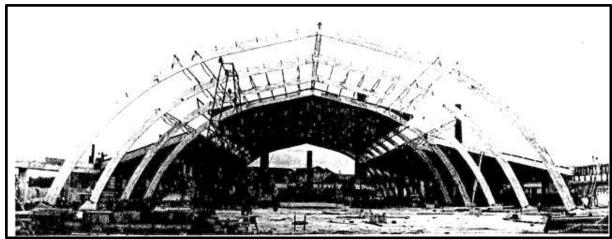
Arches under construction at Symonds St Peters Factory (Holland Street section), c1946. (Source: Nolan, 1994)
